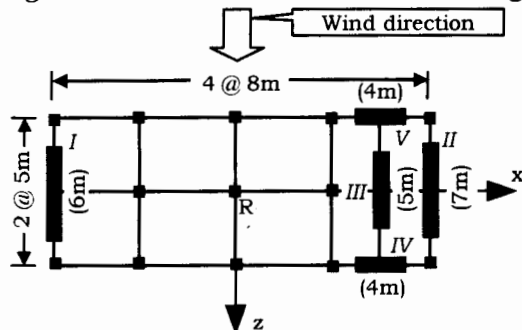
Plan of Monosymmetric Frame-Shear Wall Structural Model
